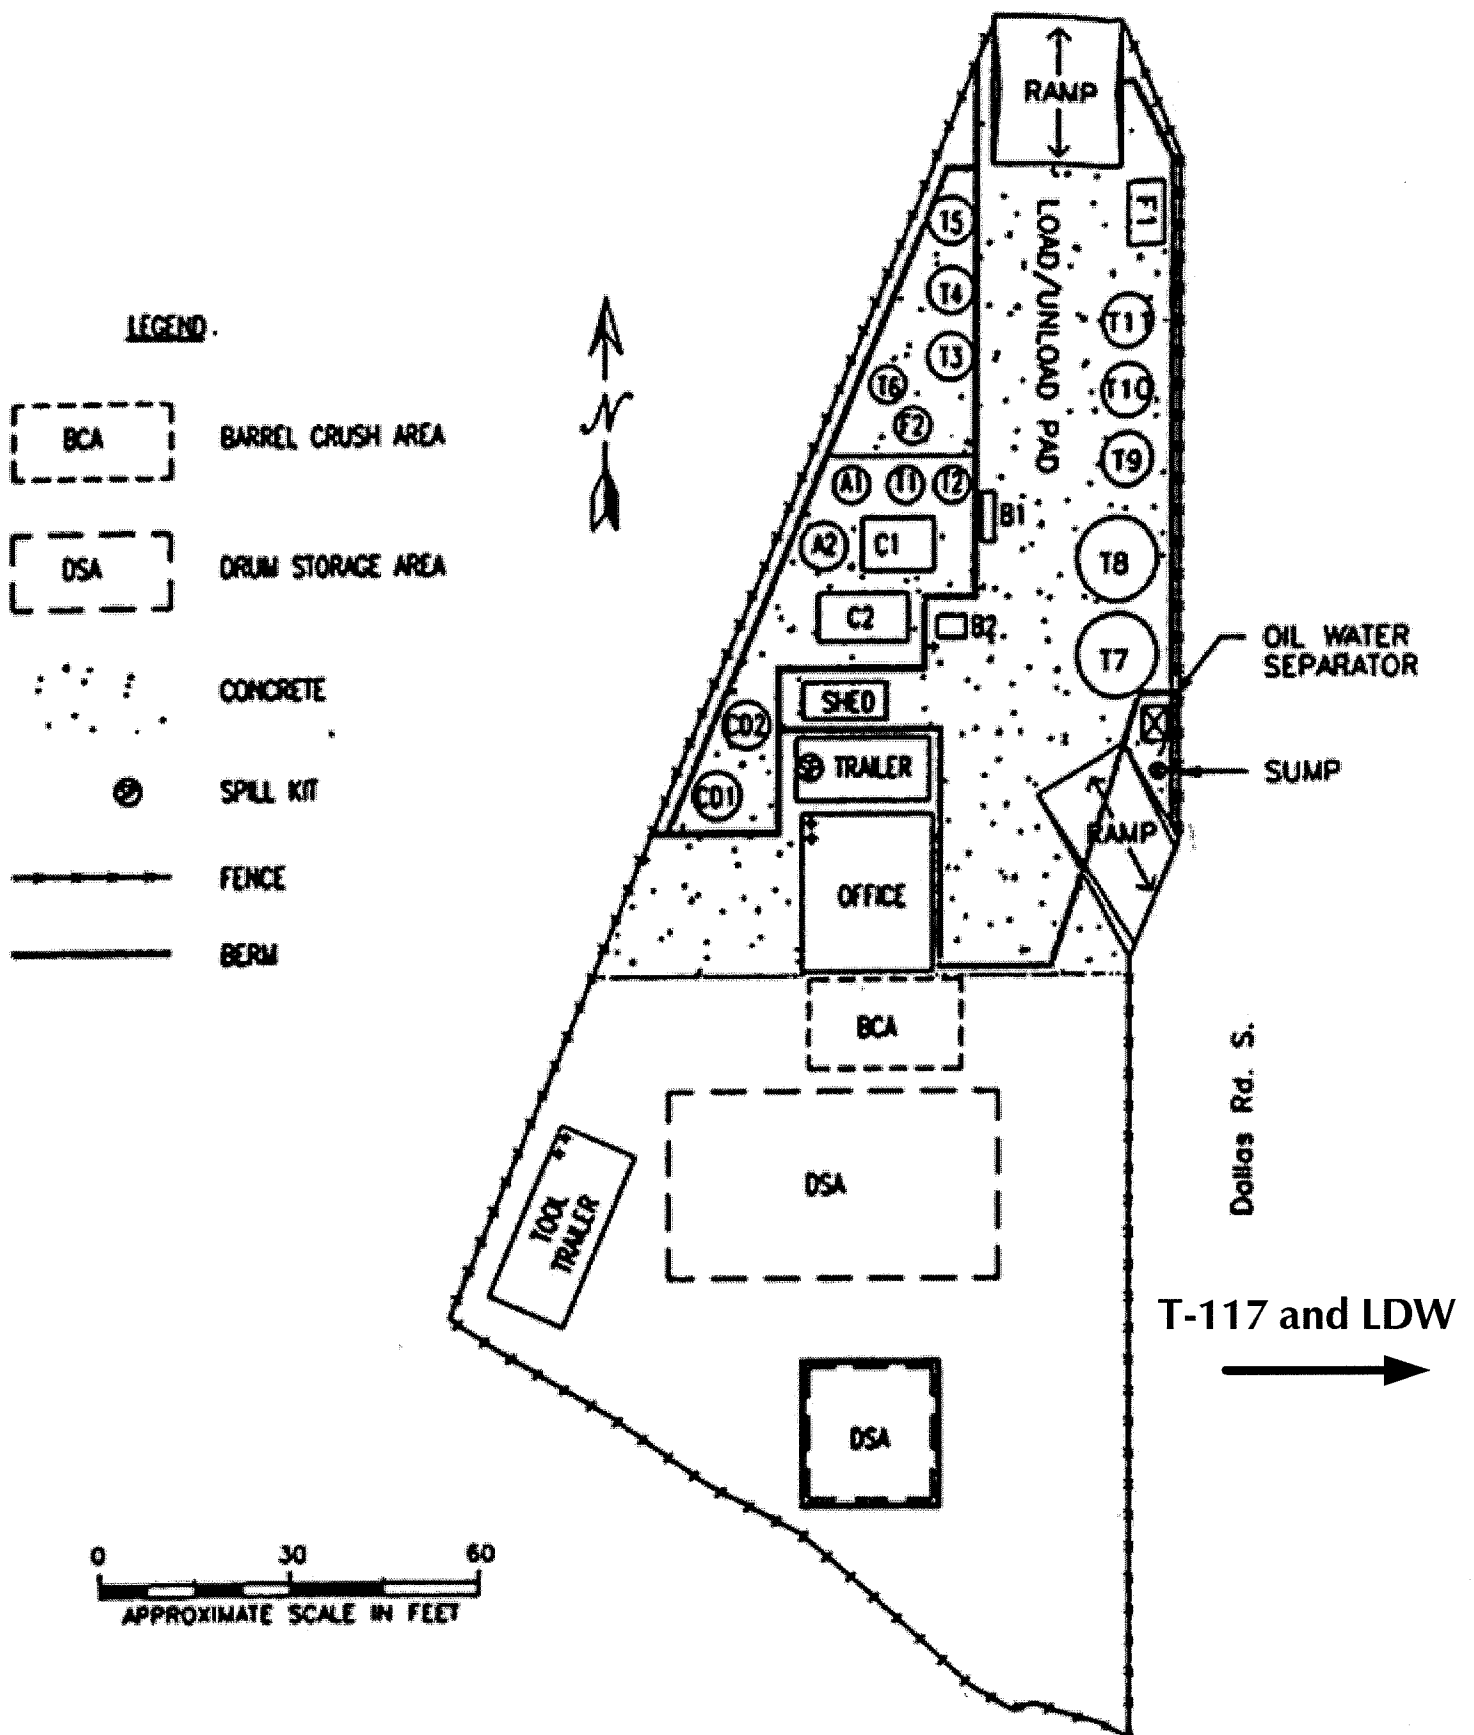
Plan of Basin Oil Plant, 2000 (EMR 2000)
